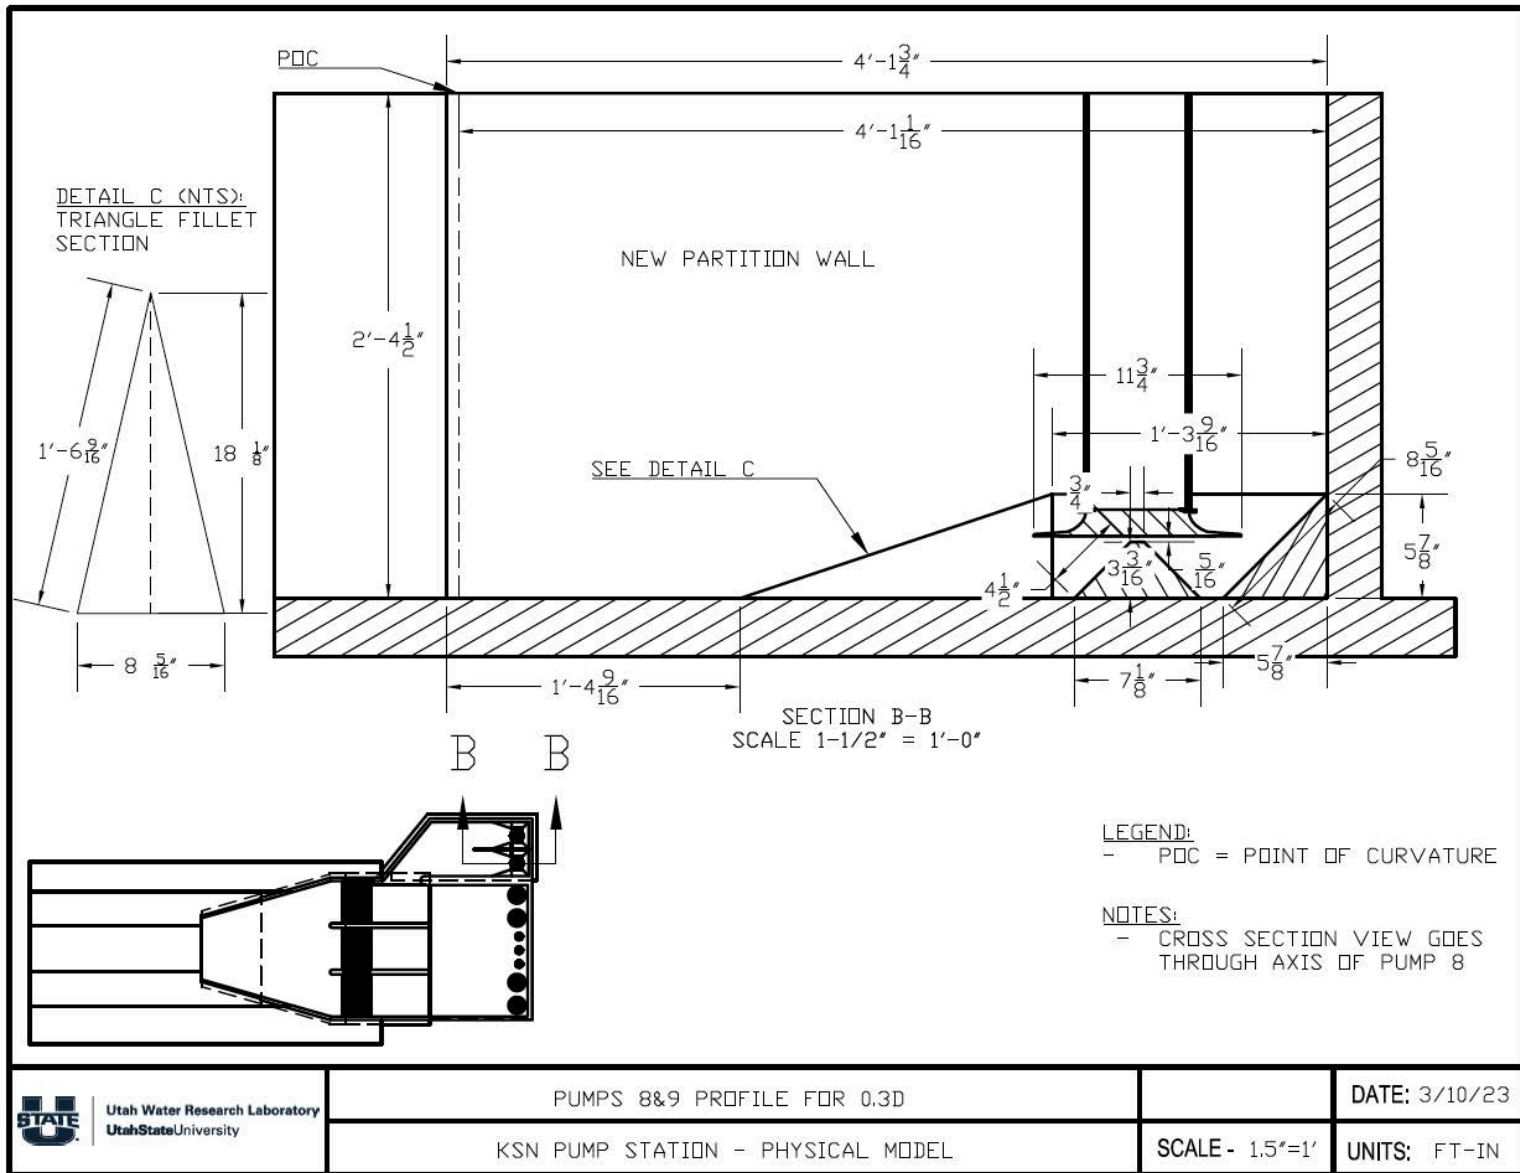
Final fix for pumps 8 and 9 (profile view model dimensions)
